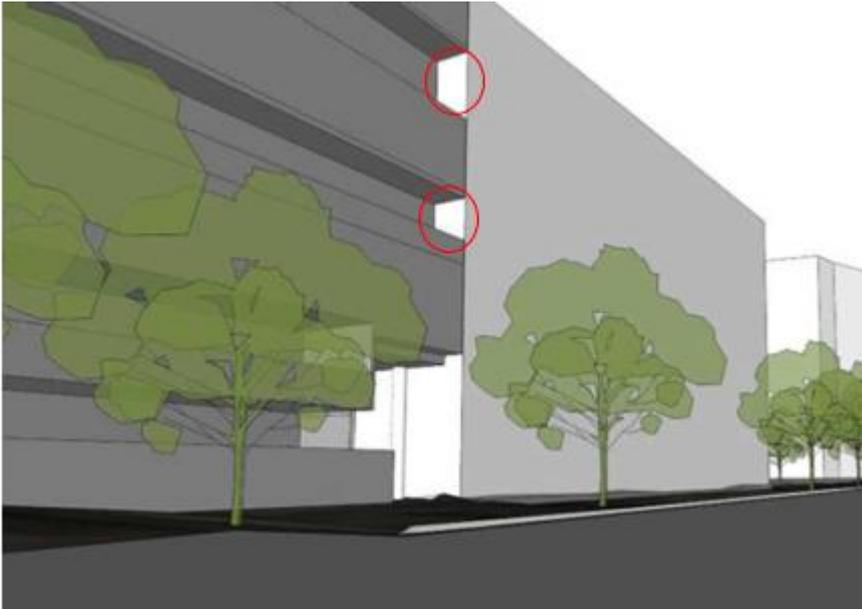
Building envelope as proposed to the boundary and impacted balconies at 5 O'Dea Avenue
